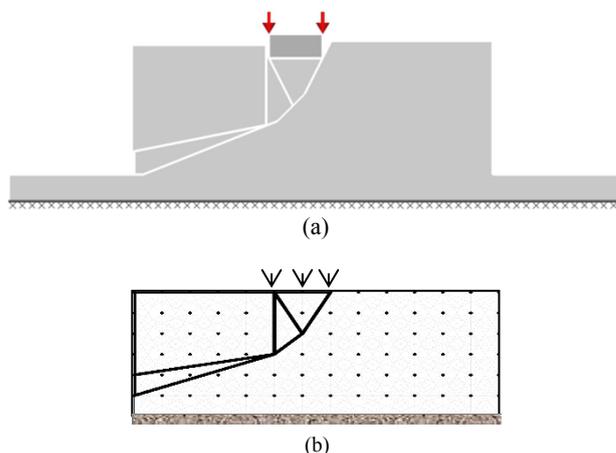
Example problem of foundation on vertically sided ‘embankment’, (a) failure geometry and mechanism generated using Limit State: GEO. (b) schematic nodal layout.
